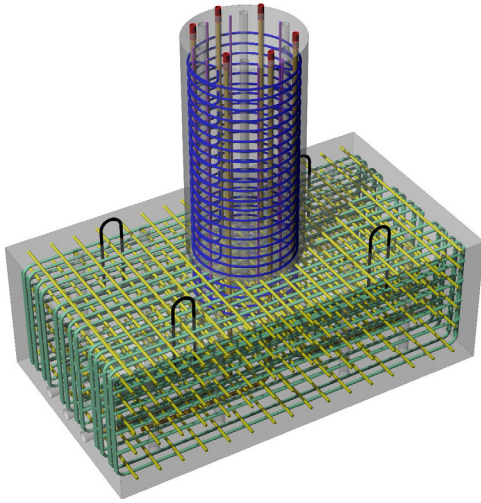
3D Precast pier model with detail of reinforcement by grasshopper
